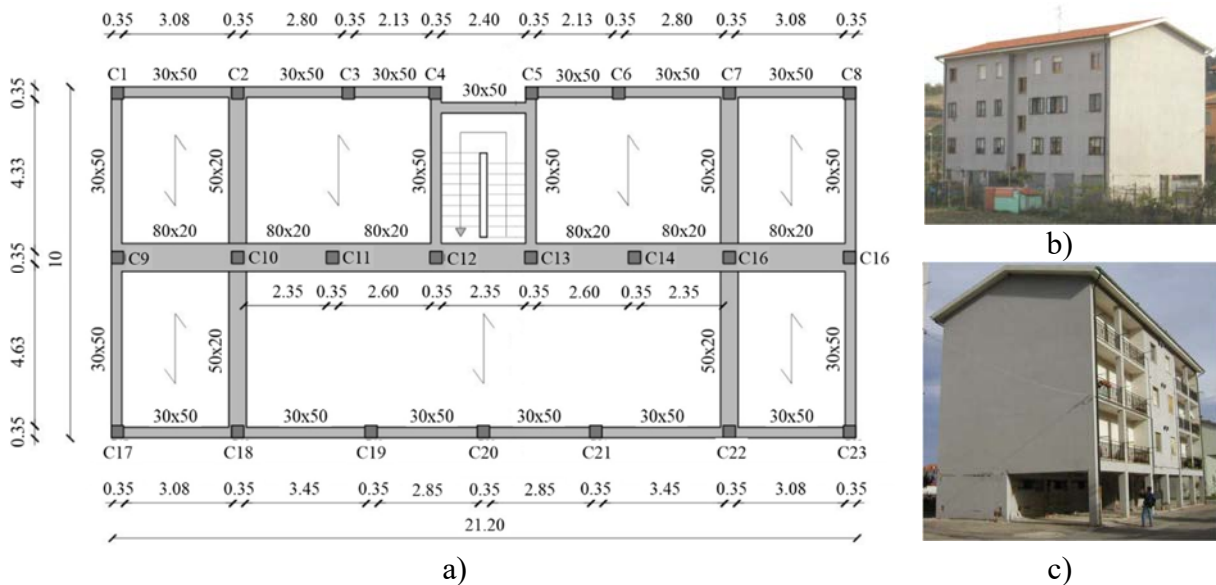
a) Plan of the ground floor of the case study building. b) Back view and c) front view
